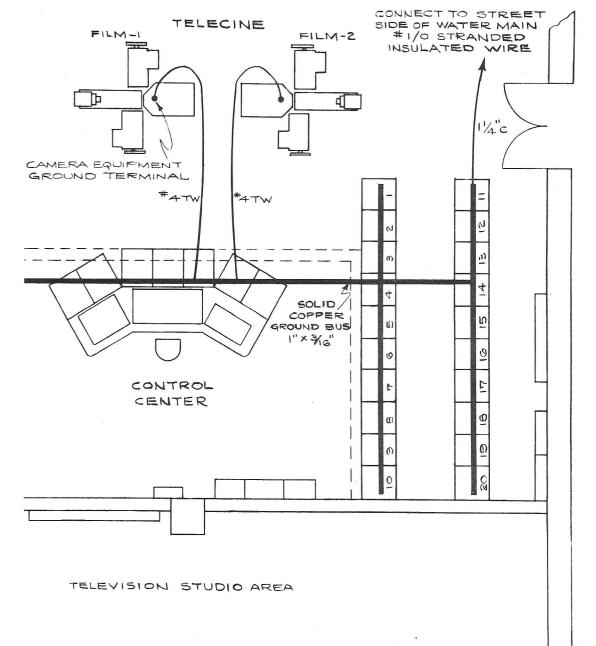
Ground system layout drawing of a portion of the technical area of a television plant.
